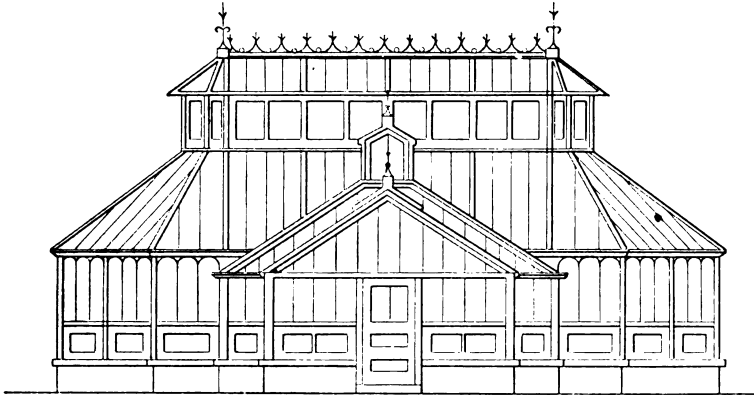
End Elevation.—Scale, 1/4 Inch to the Foot.
